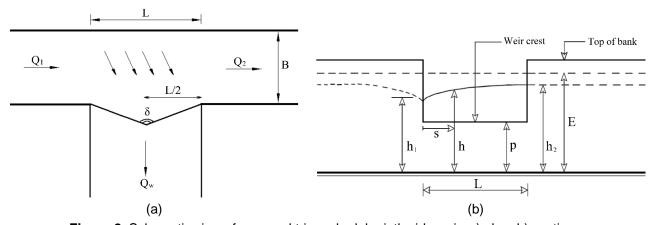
Schematic view of a normal triangular labyrinth side weir; a) plan, b) section.
